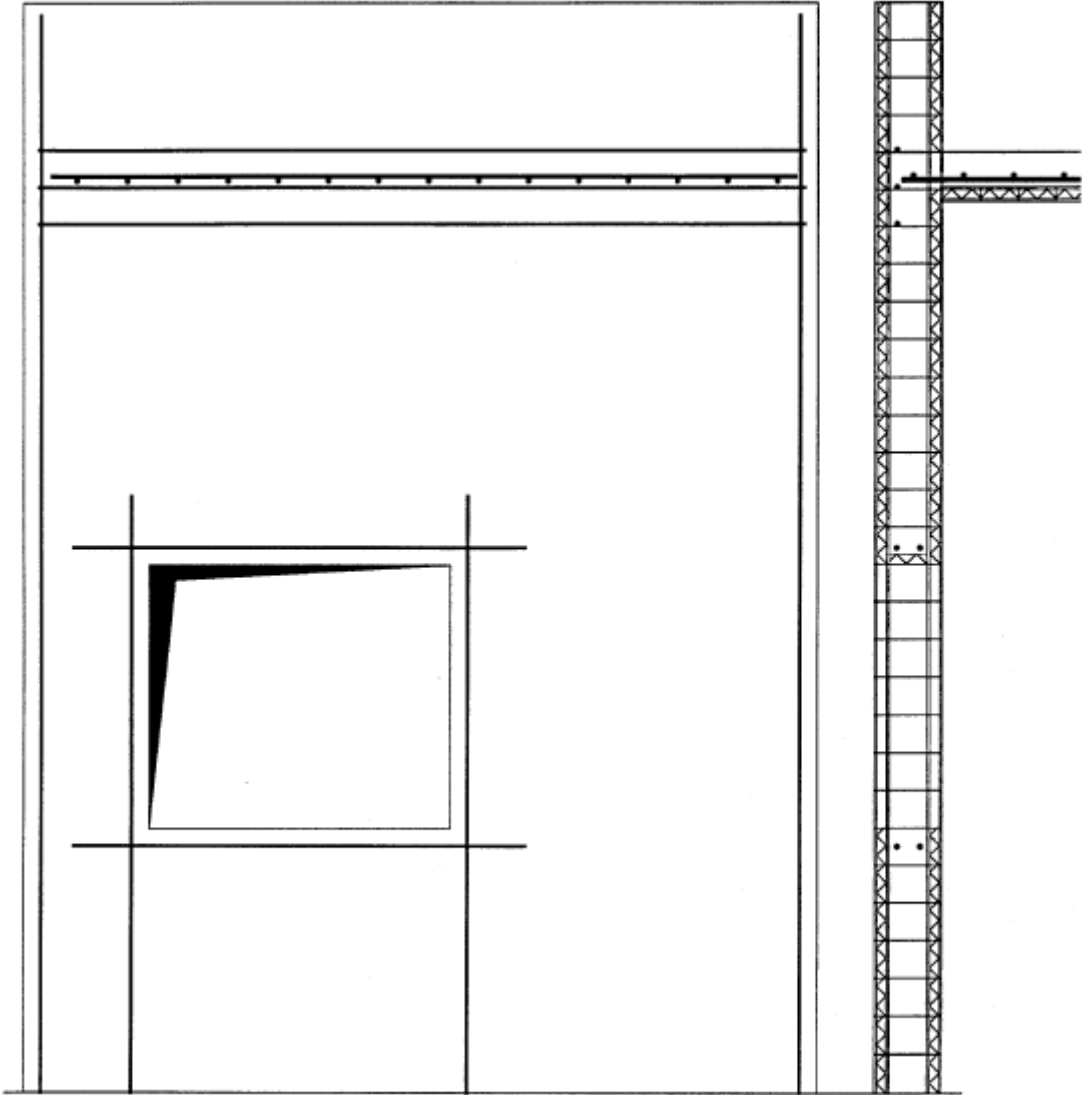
Example of a shuttering kit wall construction, with a cut-out for a window
